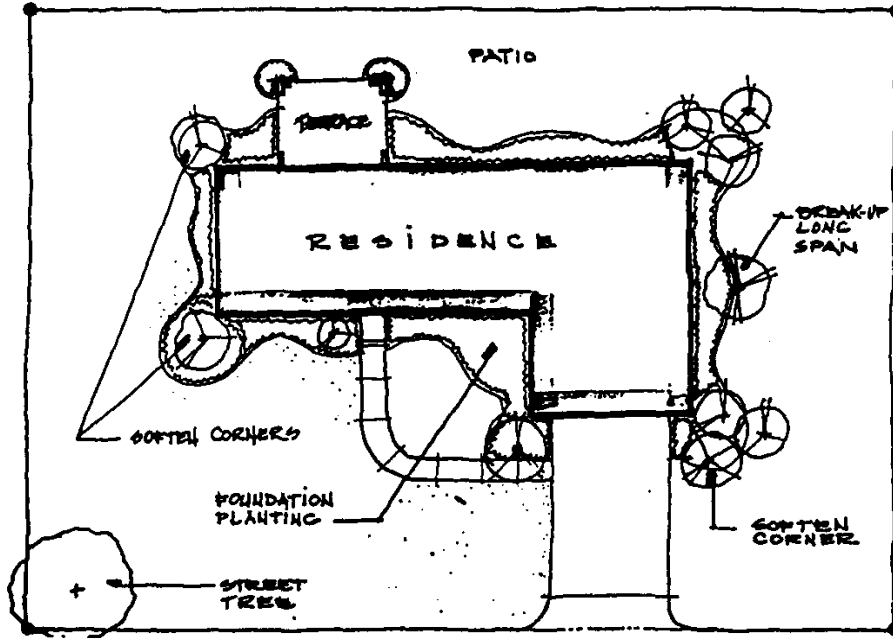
Typical Minimum Landscaping Requirements, Plan Layout
